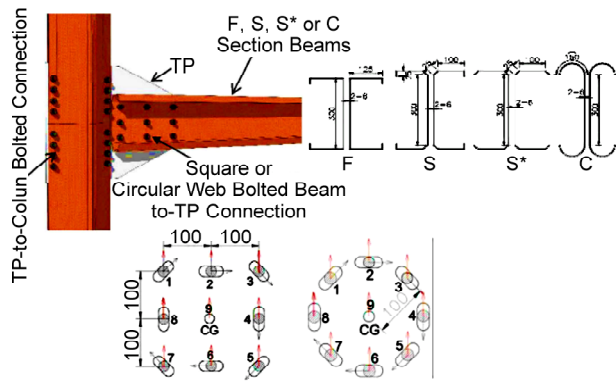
CFS joints with SB and CB bolting and F, S, S*, and C types of beam sections [9].
